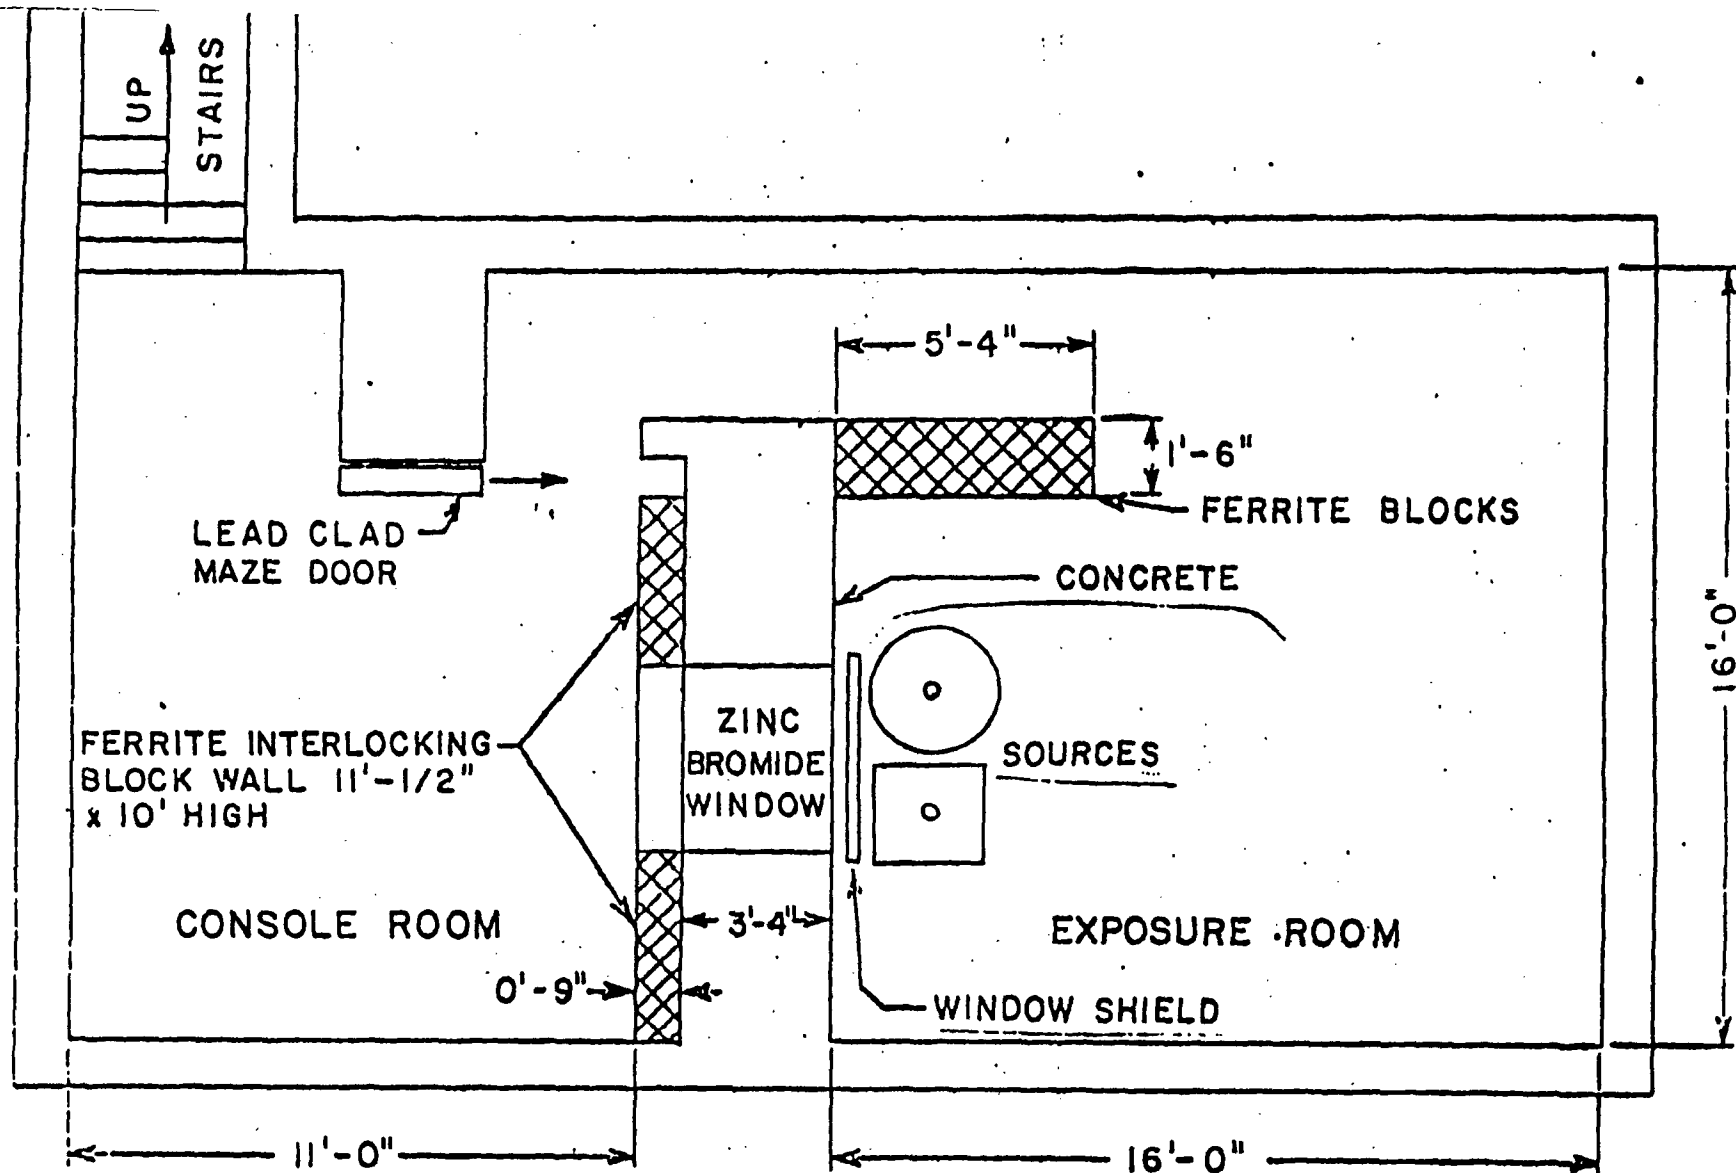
PLAN VIEW UNDERGROUND VAULT
